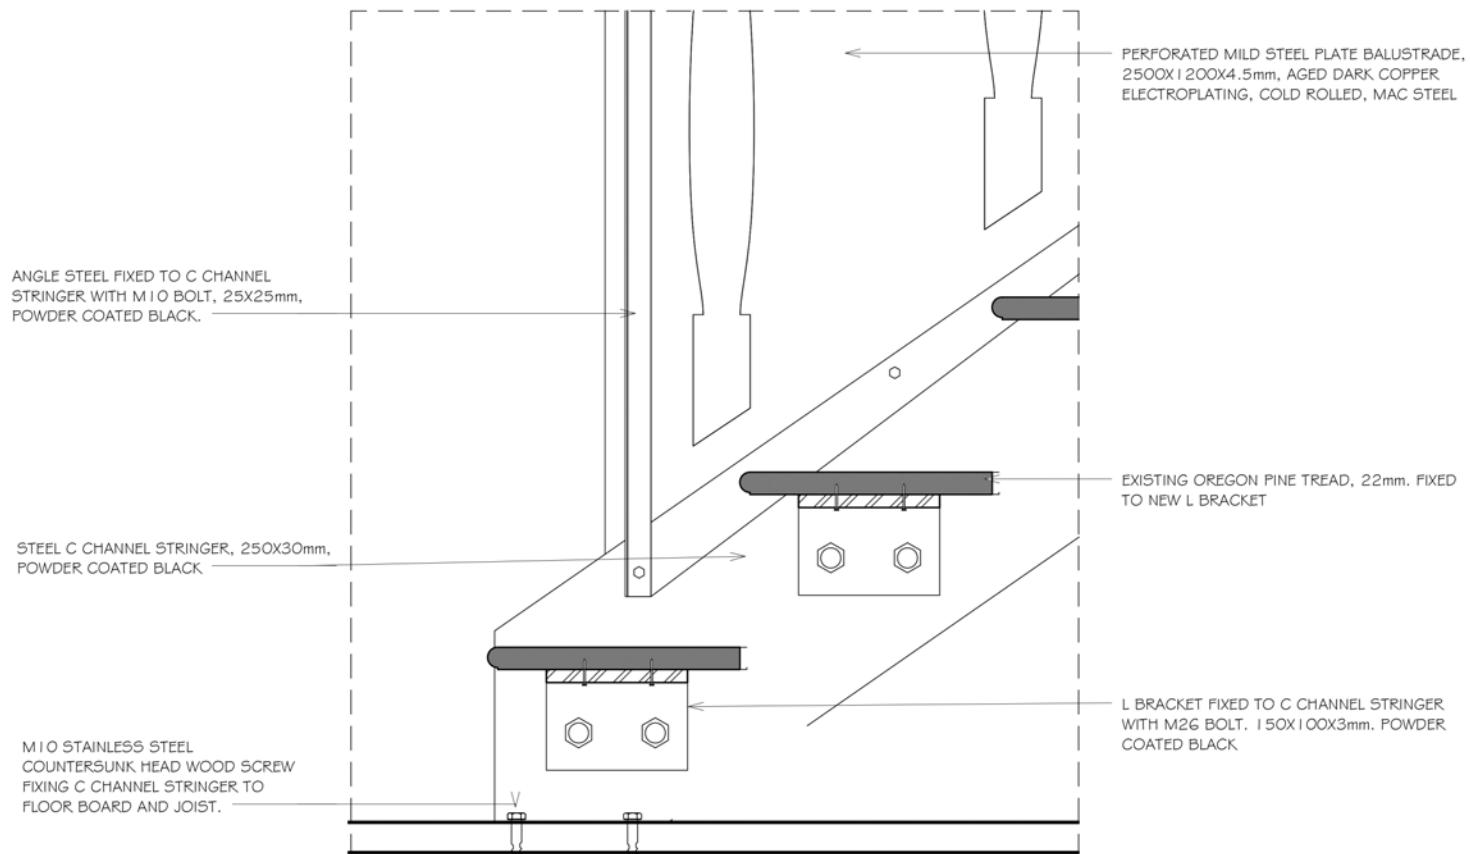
Detail 7 staircase, not to scale (Author 2018)
